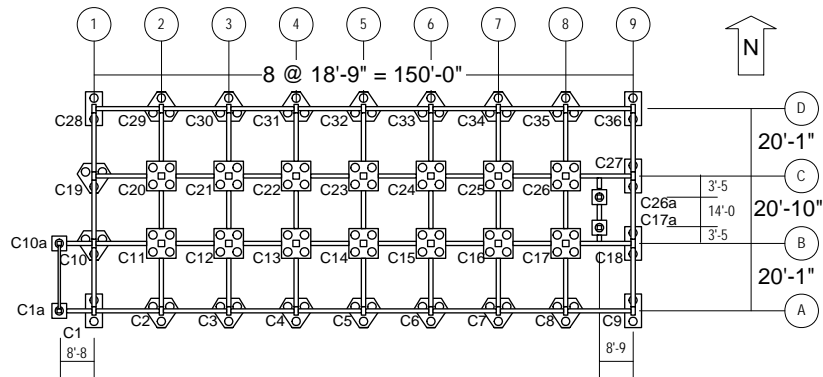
Foundation and column plan, showing designer's notation for column numbers.
